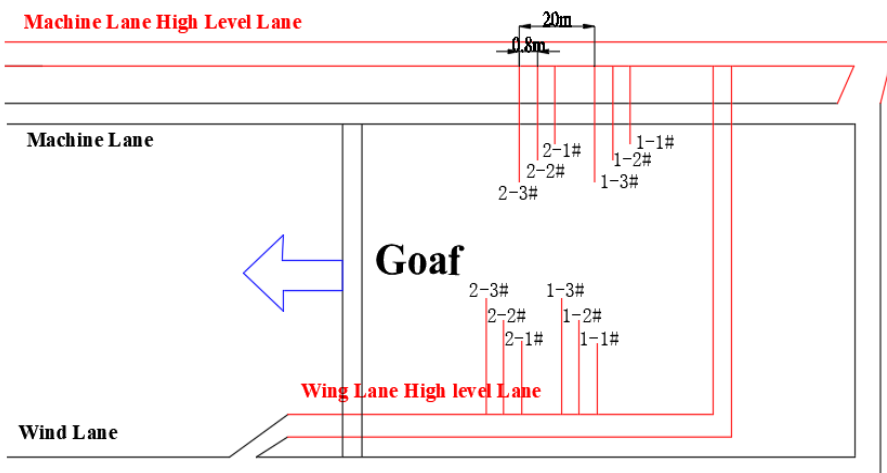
Layout plan of cross layer pressure relief pumping boreholes
